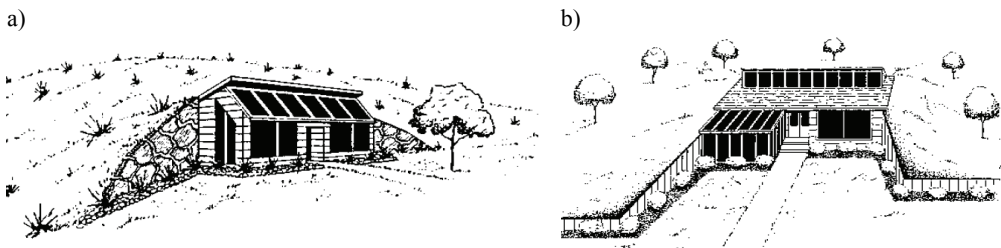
Earth-sheltered buildings with one elevation exposed: a) one level, b) two levels
